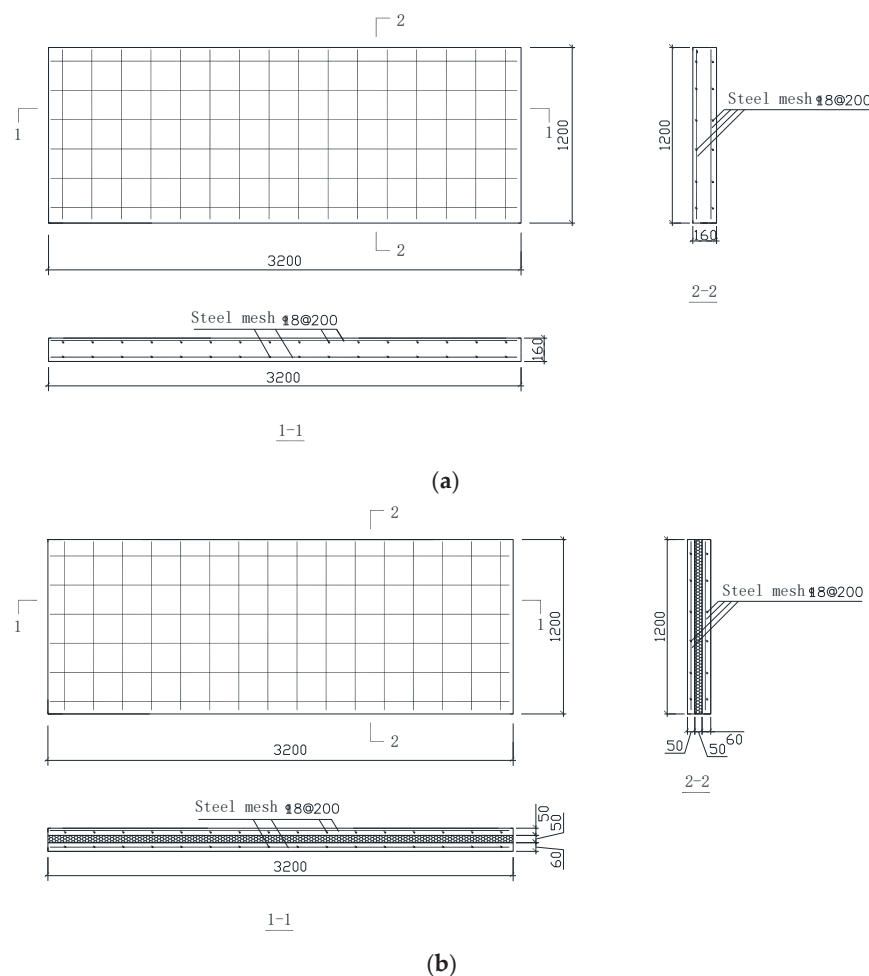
Reinforcement diagram of flexural test panels (all dimensions in mm): (a) Solid concrete wall panel; (b) Sandwich wall panel.
